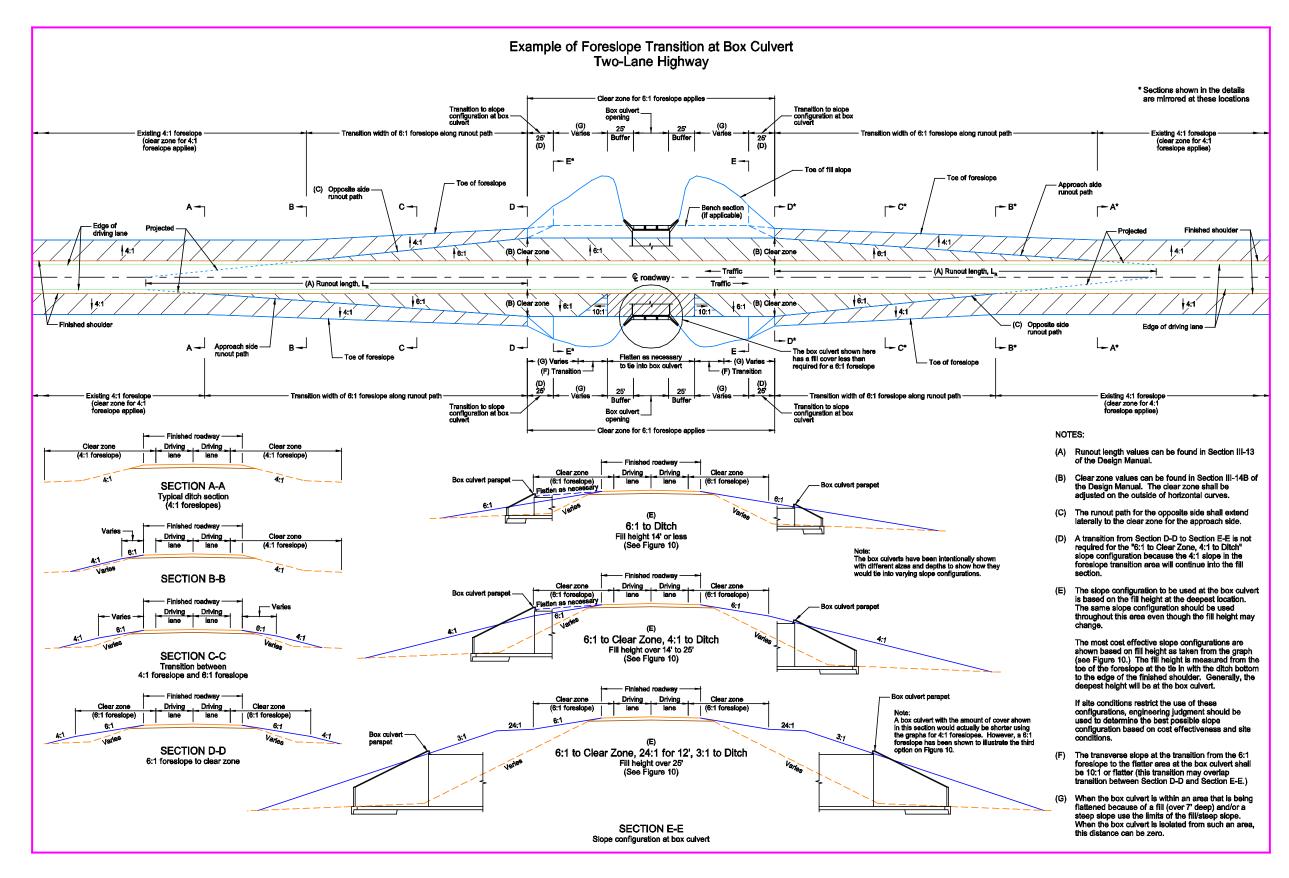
Example 2 – Foreslope Transition at Box Culvert
